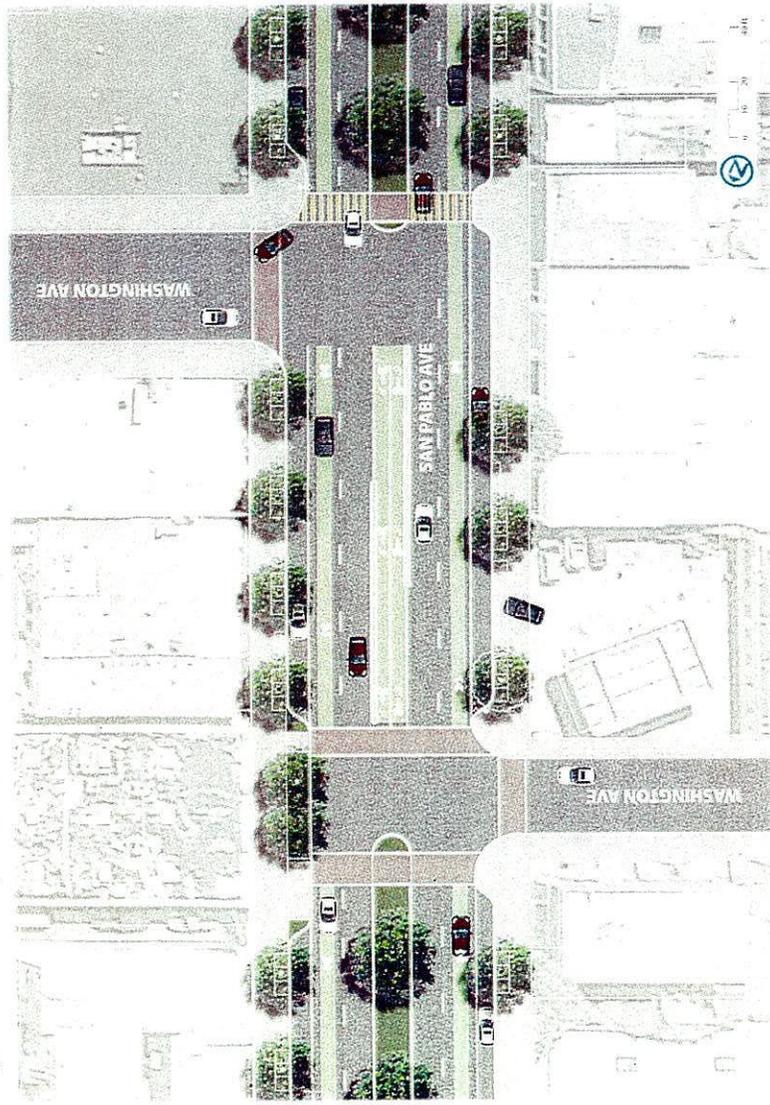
Bicycle Boulevard Crossing at San Pablo and Washington - Plan View
